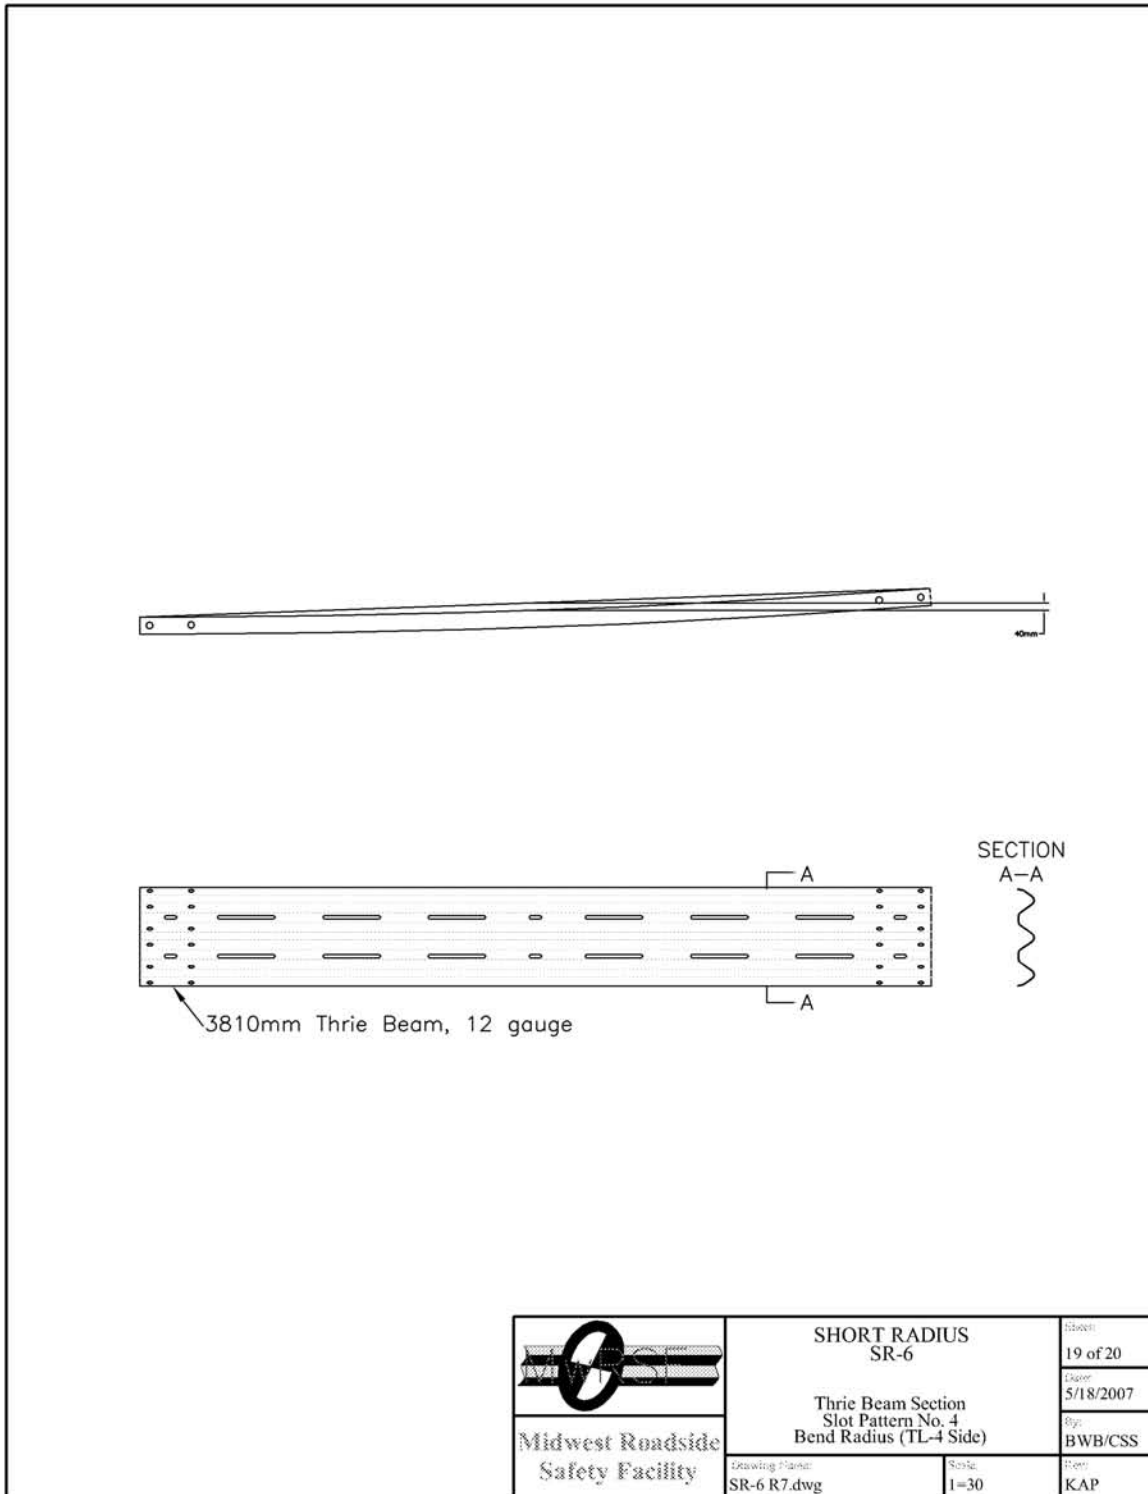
Rail Curvature, Rail Section No. 4, Test SR-6
